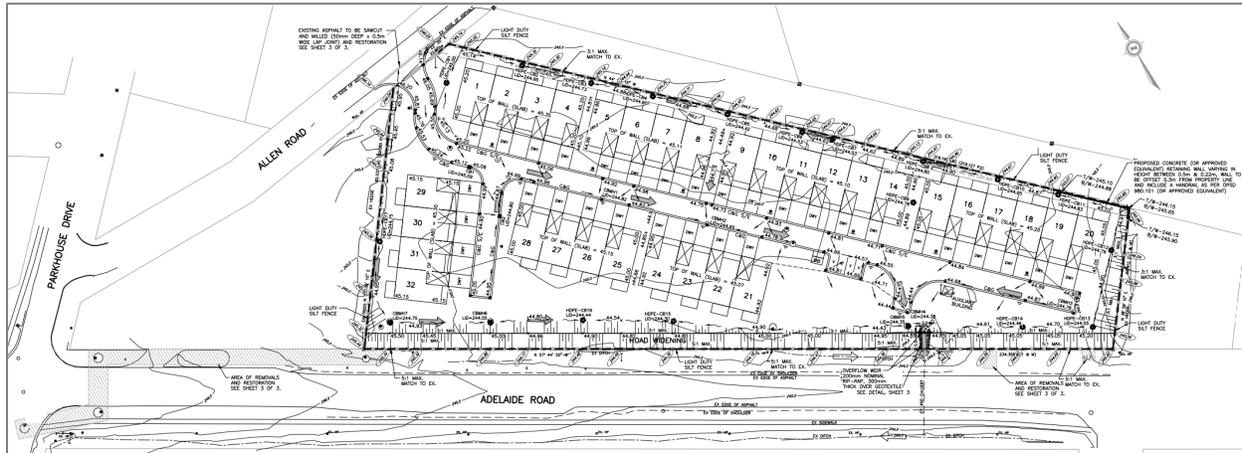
is a proposed site plan that depicts the development of 32 townhouse units on the subject property. Access to the property is proposed to be from Allen Road.
